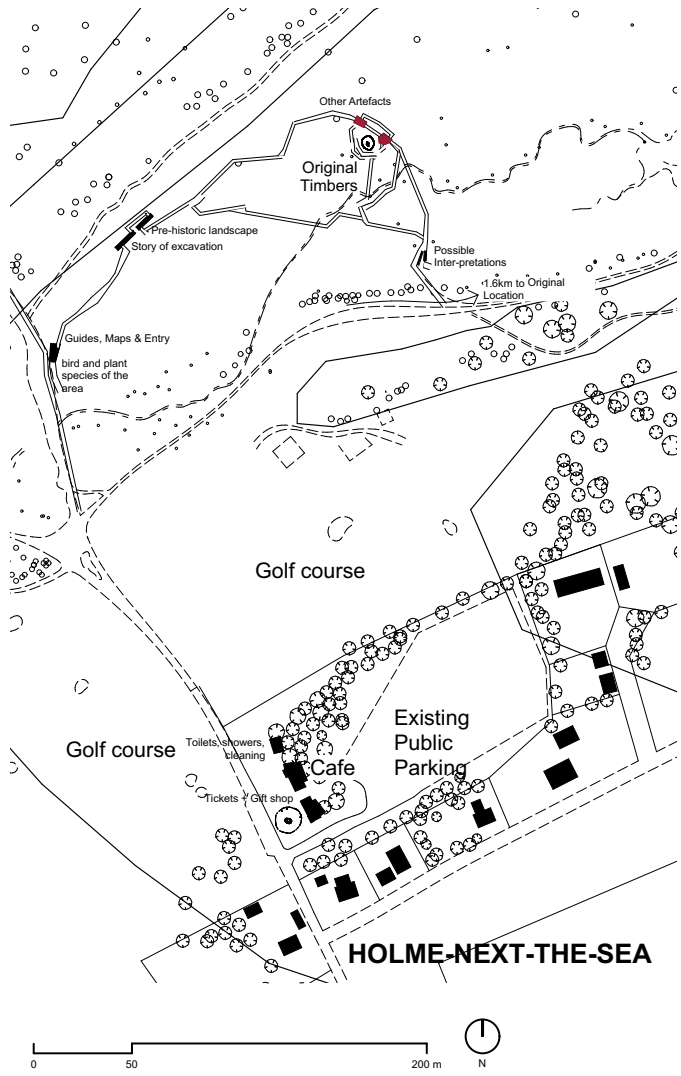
(Left) Preliminary plan of Pavilion 3 housing the original timbers of Seahenge (Author, 2023).
